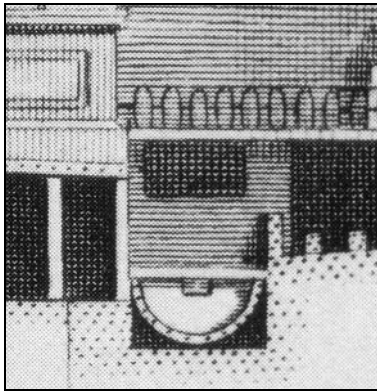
Ideal opera house by P. Patte. Section : detail of the semicylindrical chamber under the orchestra pit floor ([6] by Forsyth)
